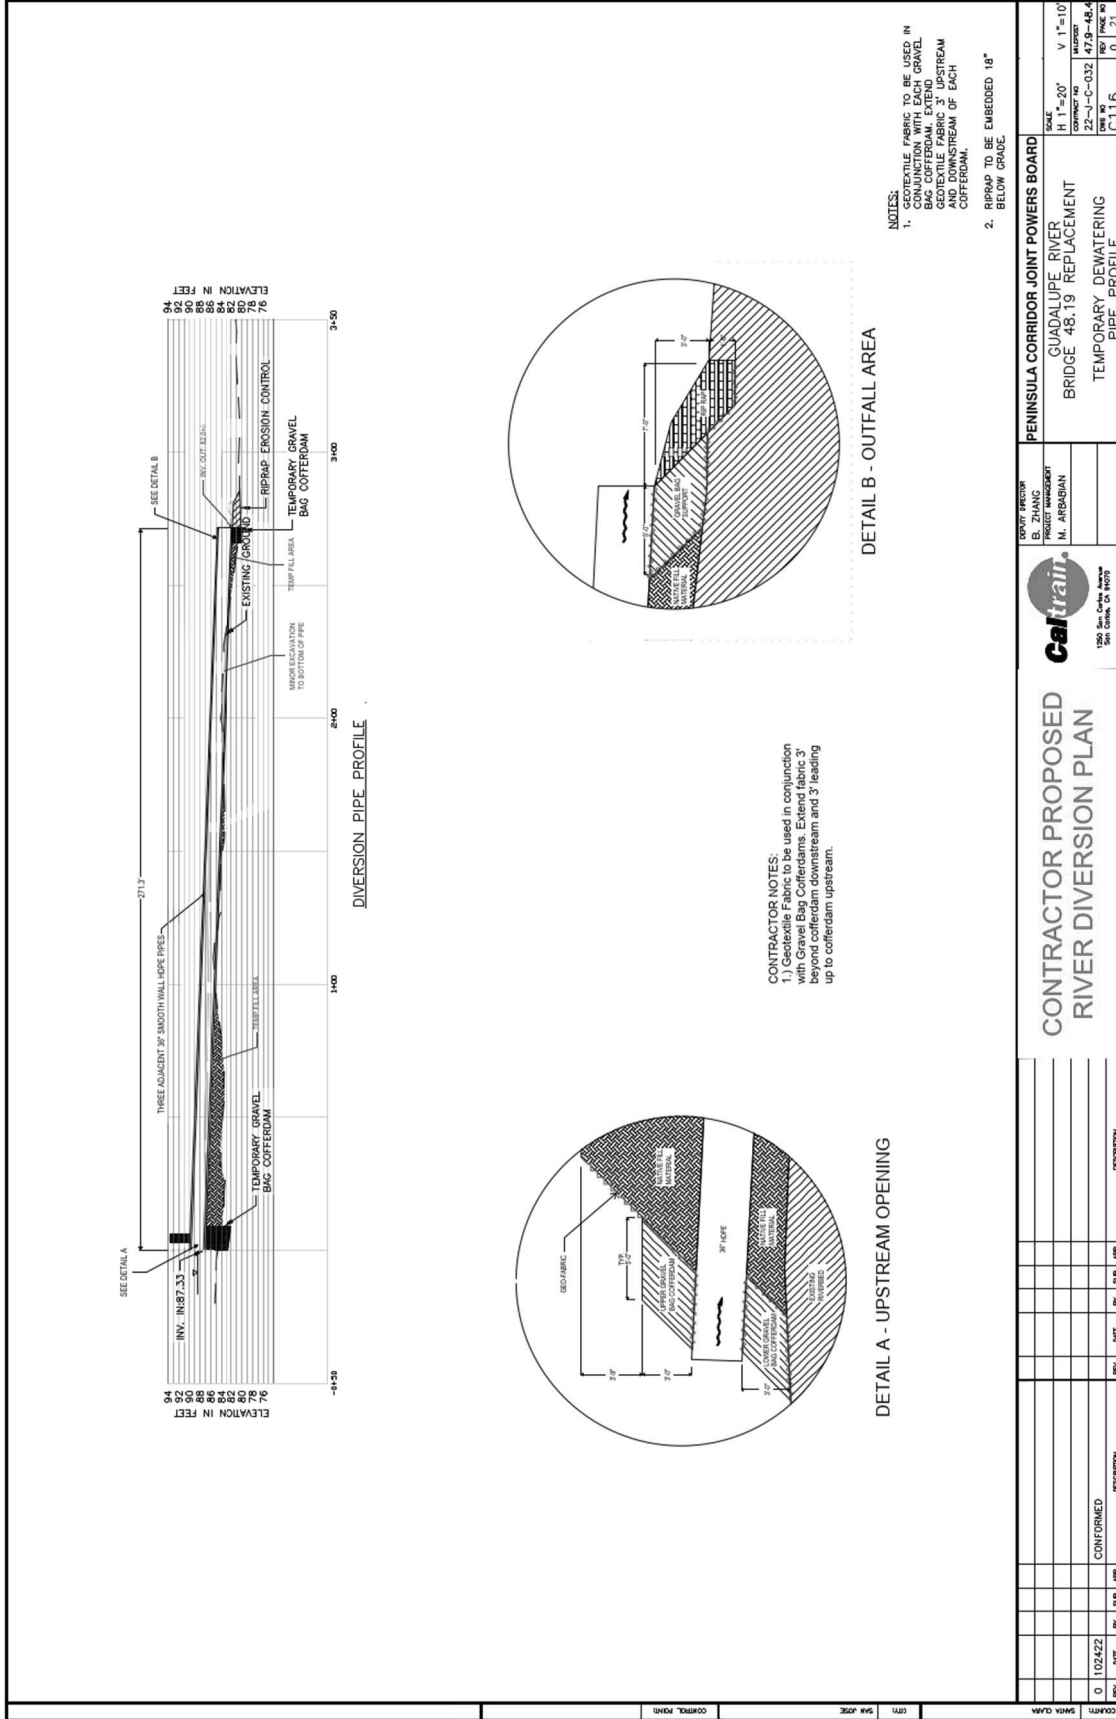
Cross-Section of Diversion Plan Submitted to CDFW in 2023
